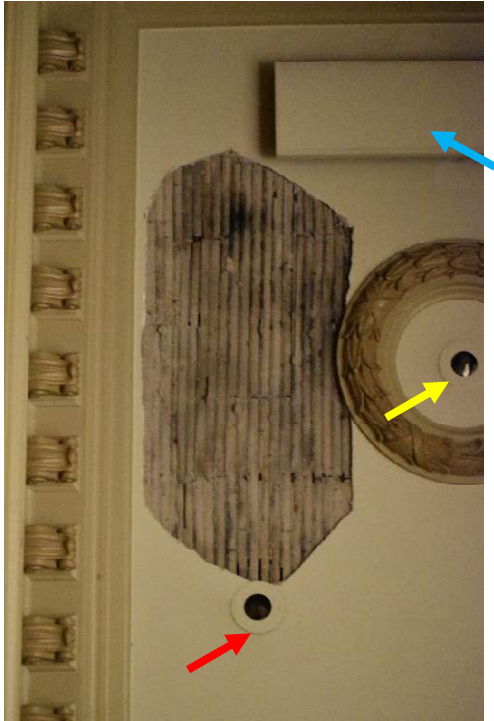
Area of plaster failure, looking overhead. West is oriented up.
